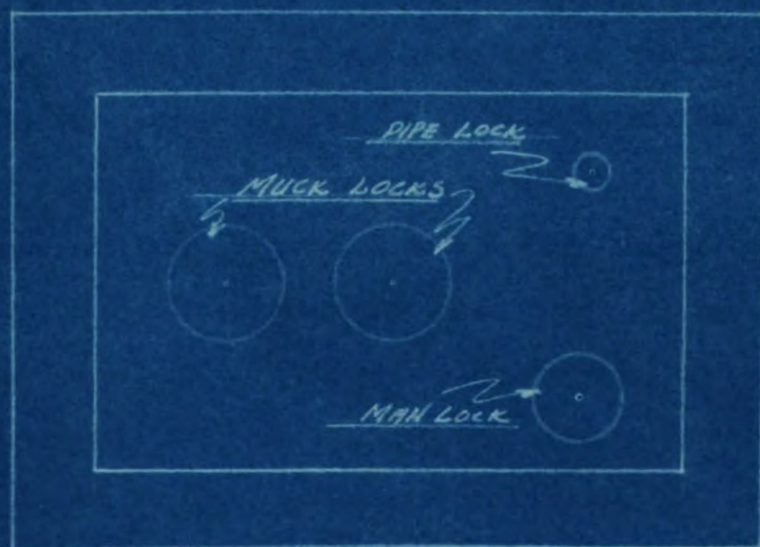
AIR LOCKS IN SHAFT DECK.
